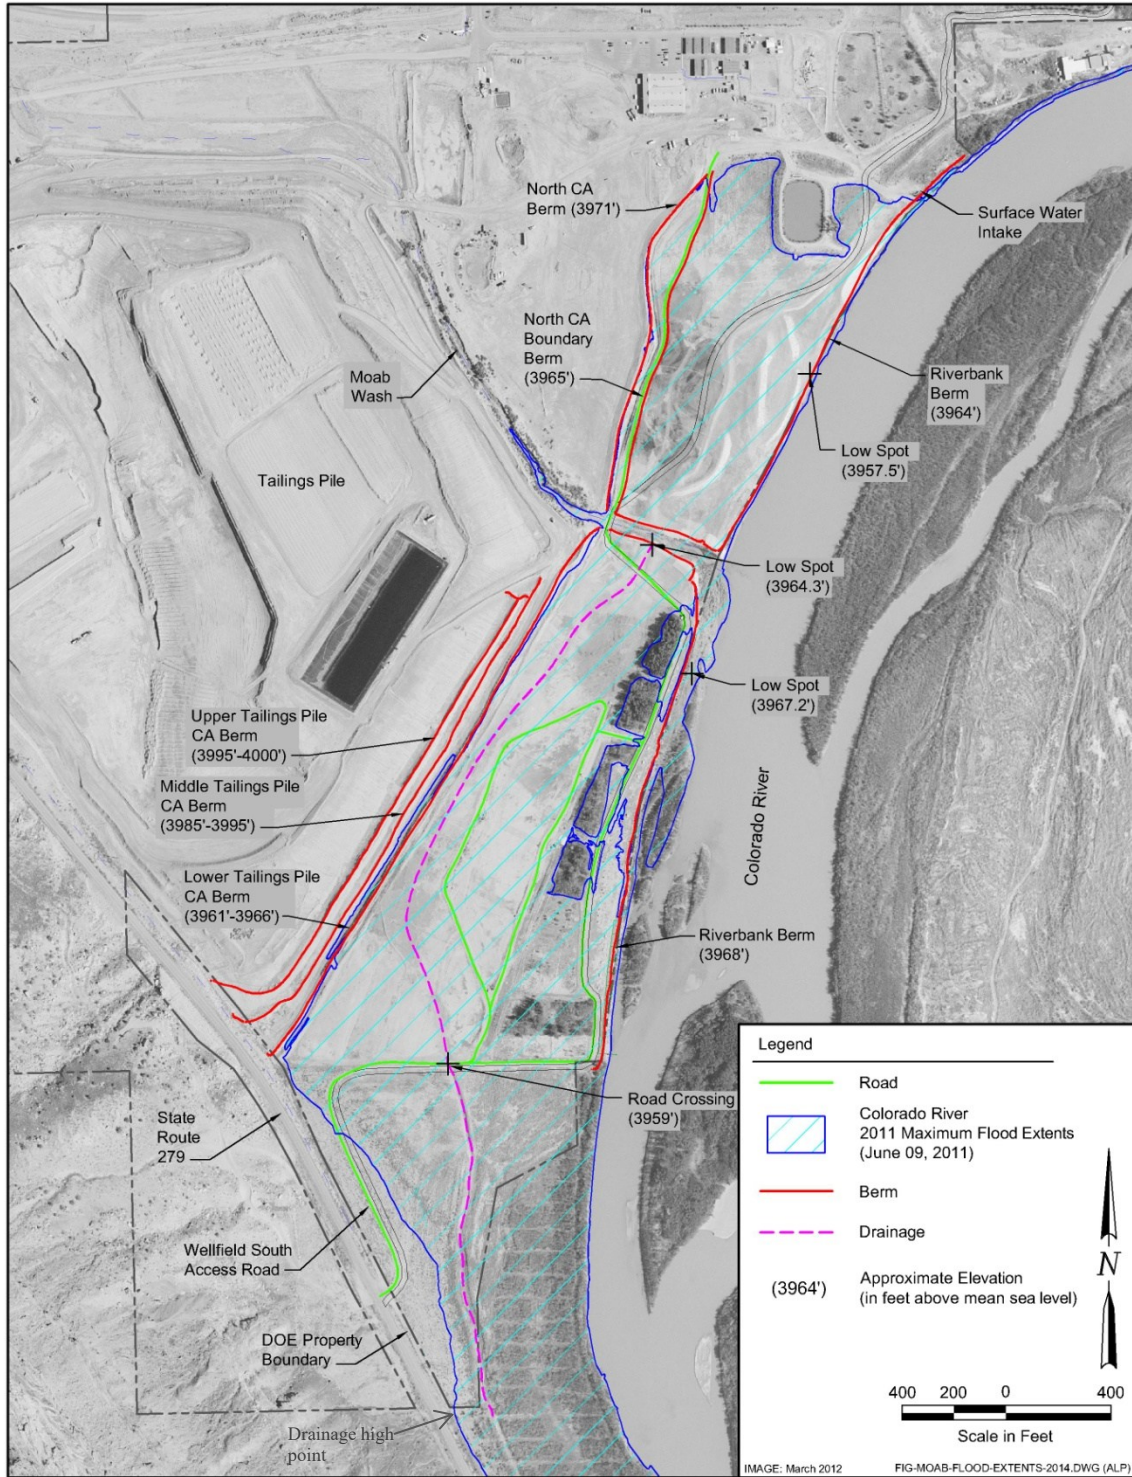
Moab Site Features, Colorado River Elevations, 2011 Flood Extent, and CA Berms and Elevations
